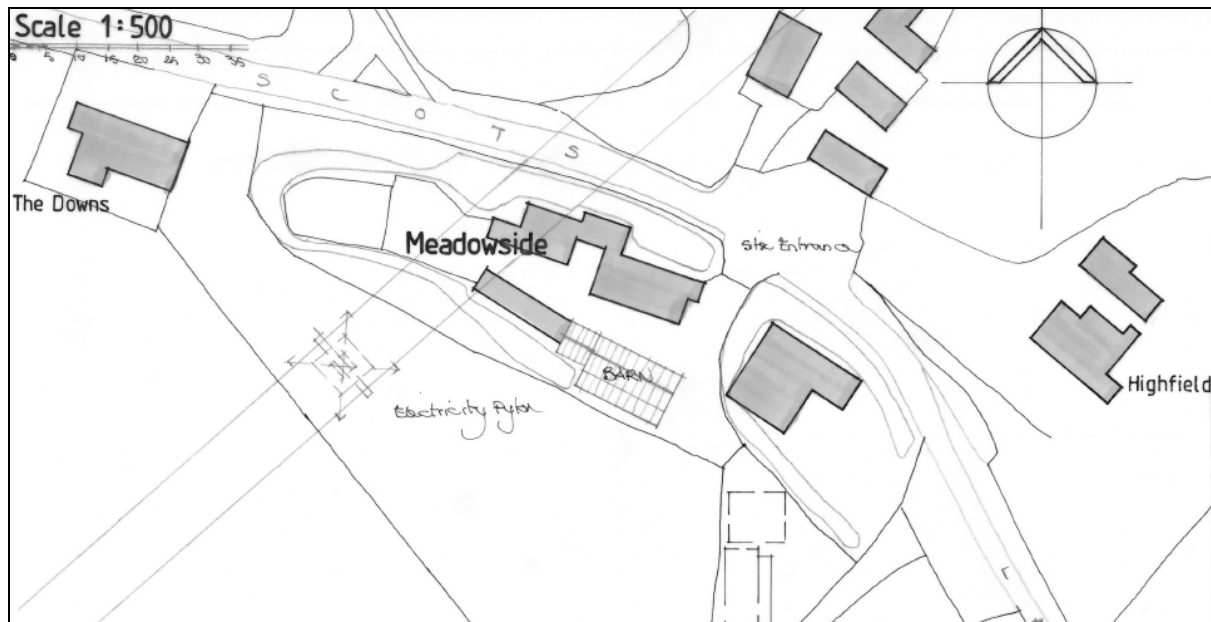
Proposed block plan (NB. Barn is the proposed dwelling)
